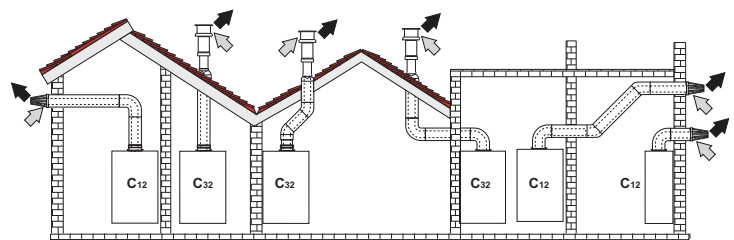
Examples of connection with coaxial pipes (⇨ = Air / ⇨ = Fumes)
